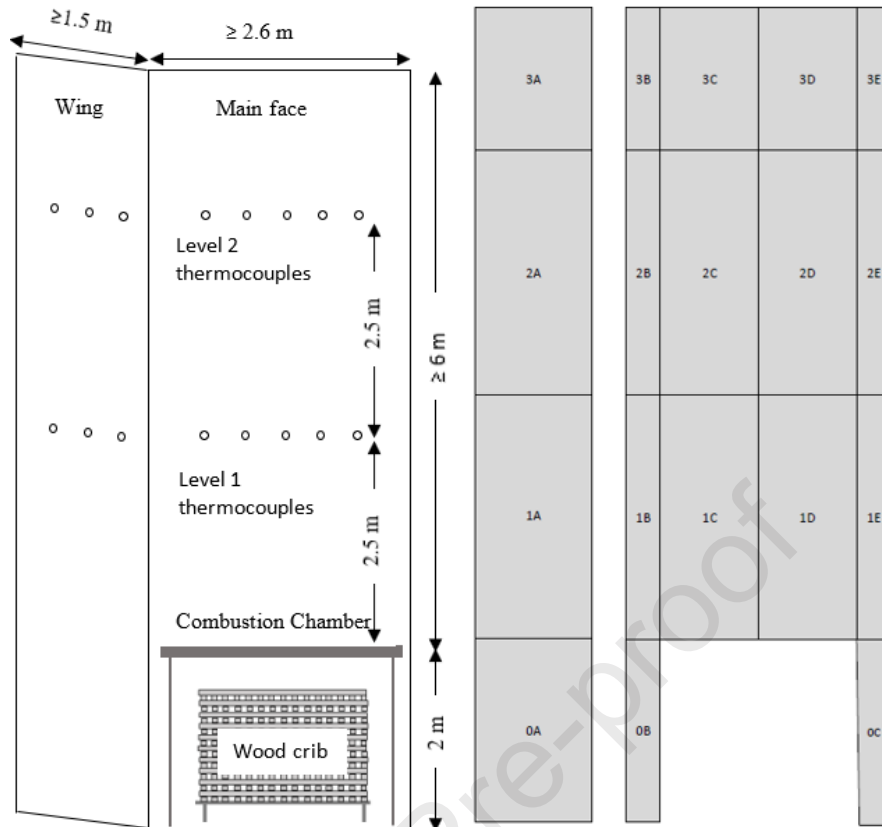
Schematic of BS 8414 test facility (left) and layout of cladding panels in DCLG BS 8414 tests (right) [14].
